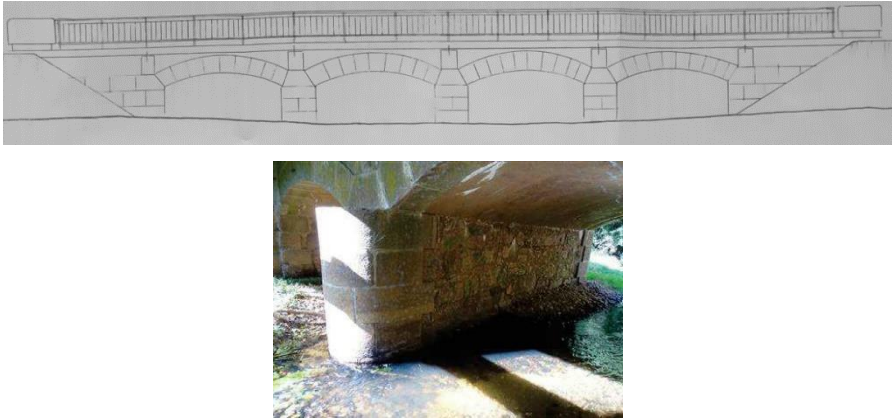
Presence of cracking at bridge abutments within Class IV
